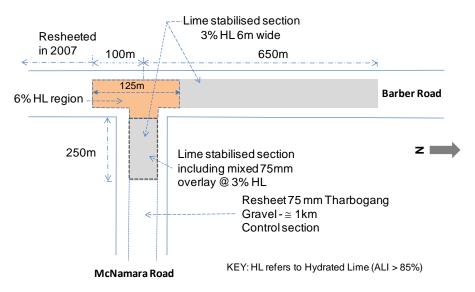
View of stabilisation area for Barber and McNamara Roads, Griffith.
